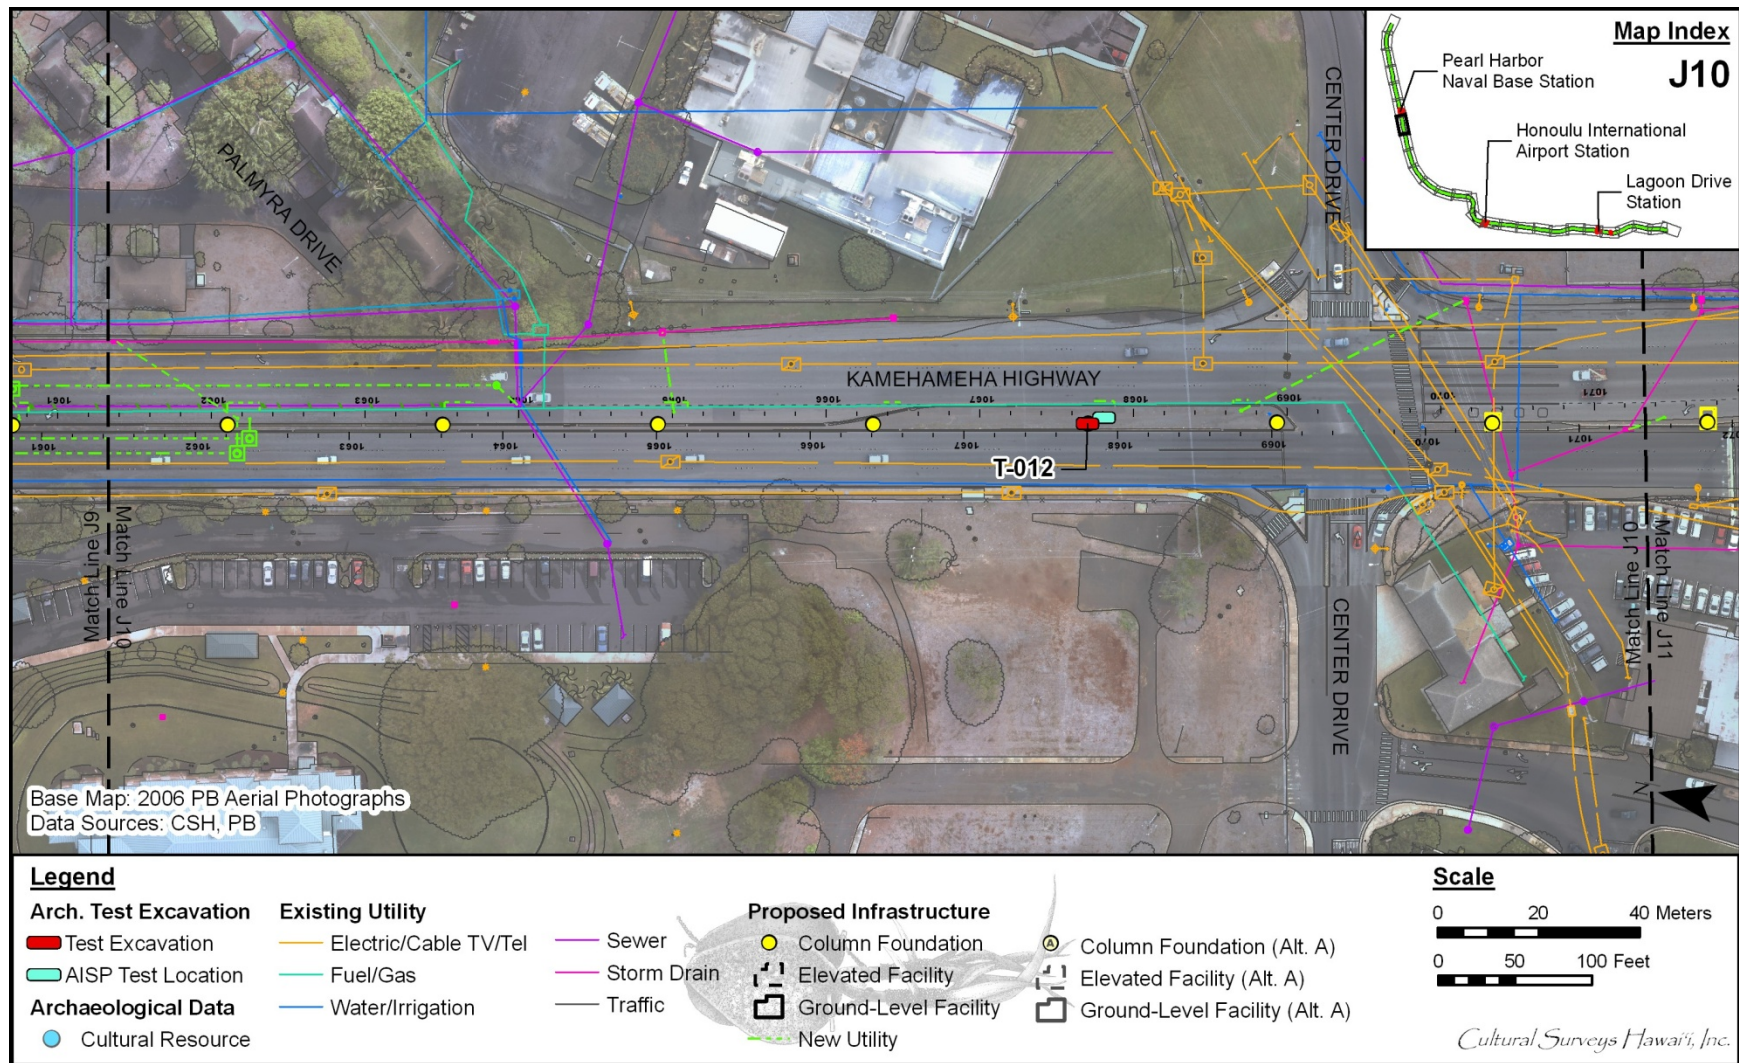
Map Sheet J10 (near Center Drive), one test excavation (T-012) at column foundation @ 1056+50
